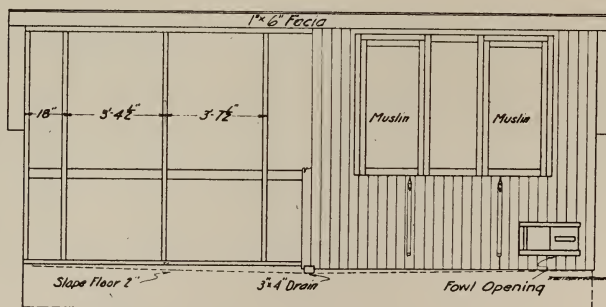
Front elevation of farm poultry house. At left is shown framing; at right the completed front. The location of rear windows for this house, and method of laying roofing paper are shown in figure 21.
